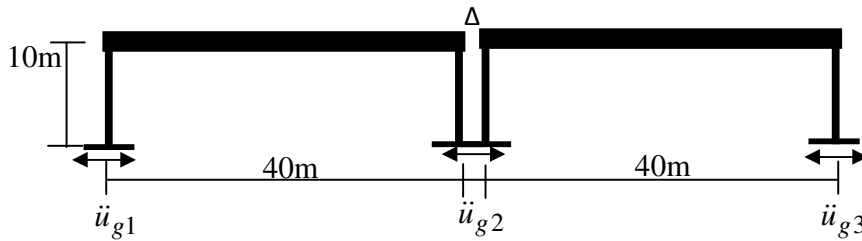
Two generic SDOF RC frame models to calculate required separation distance
